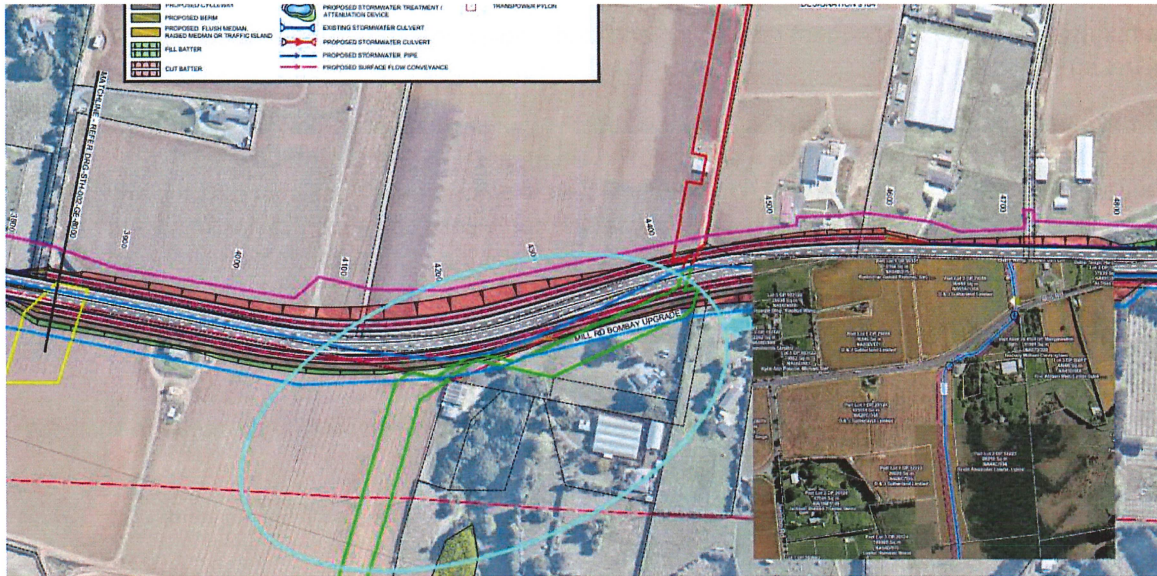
Snip from Sheet 2 of 2 *General Arrangement Layout Plan* with insert showing location of 200 pipeline not shown on plan although the Designation area is shown.
